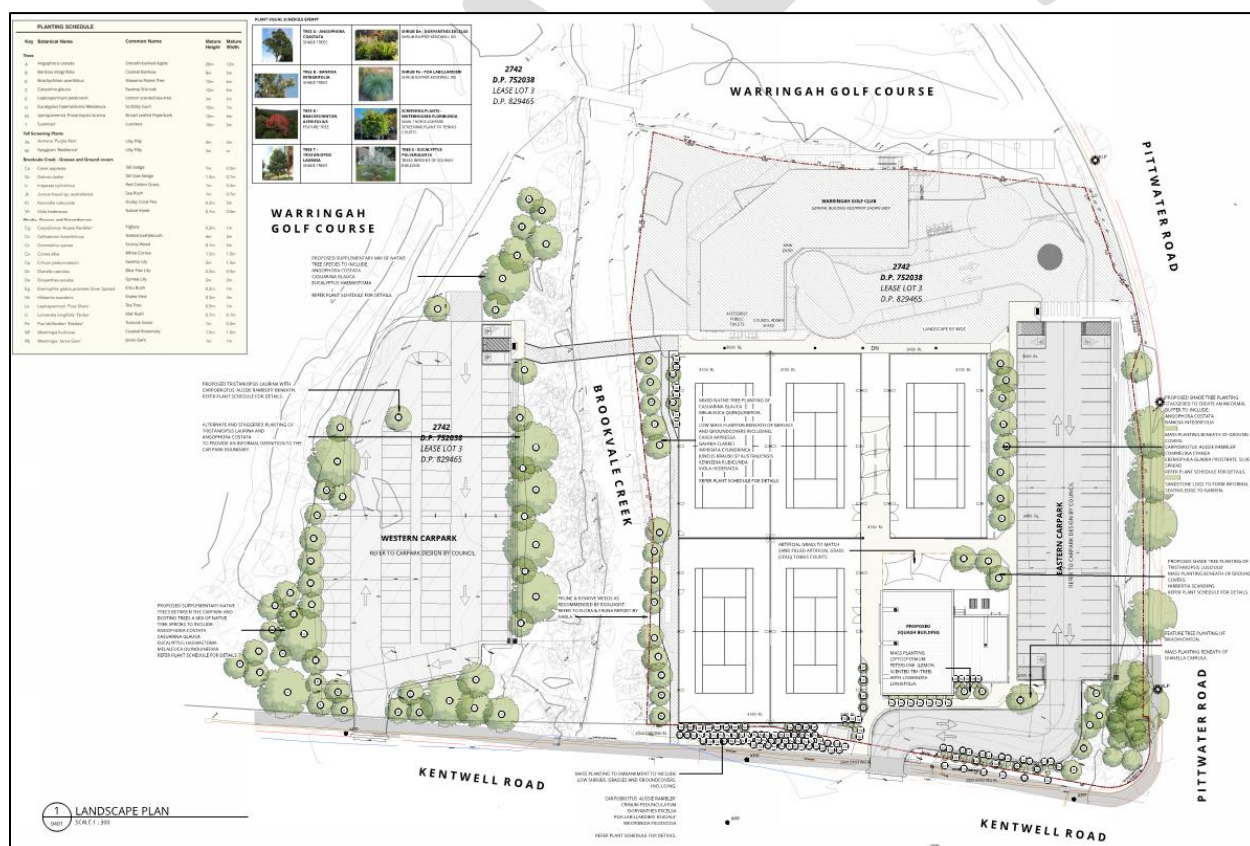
Landscape Plan (Source: Webber Architects, 2024)
